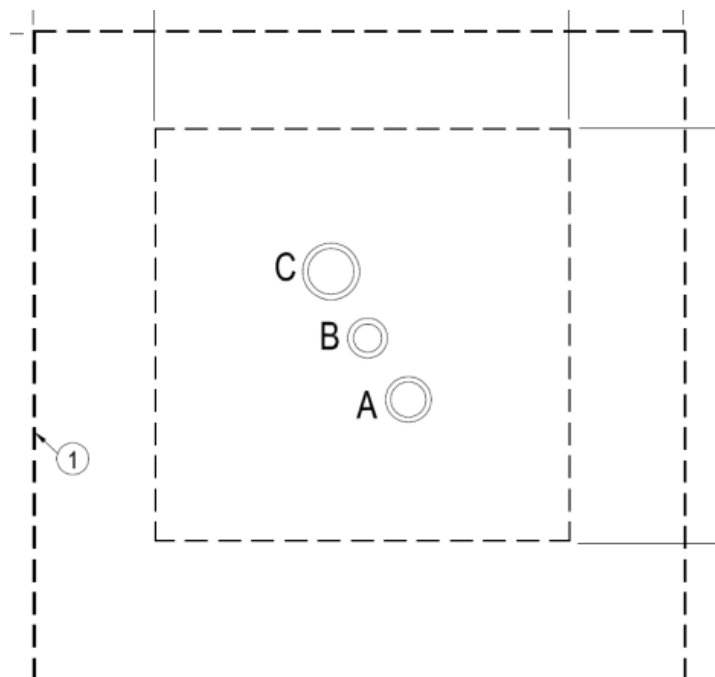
Plastic pipe with PROMASEAL® FC 40 – 65 collars (floor underside plan view)
